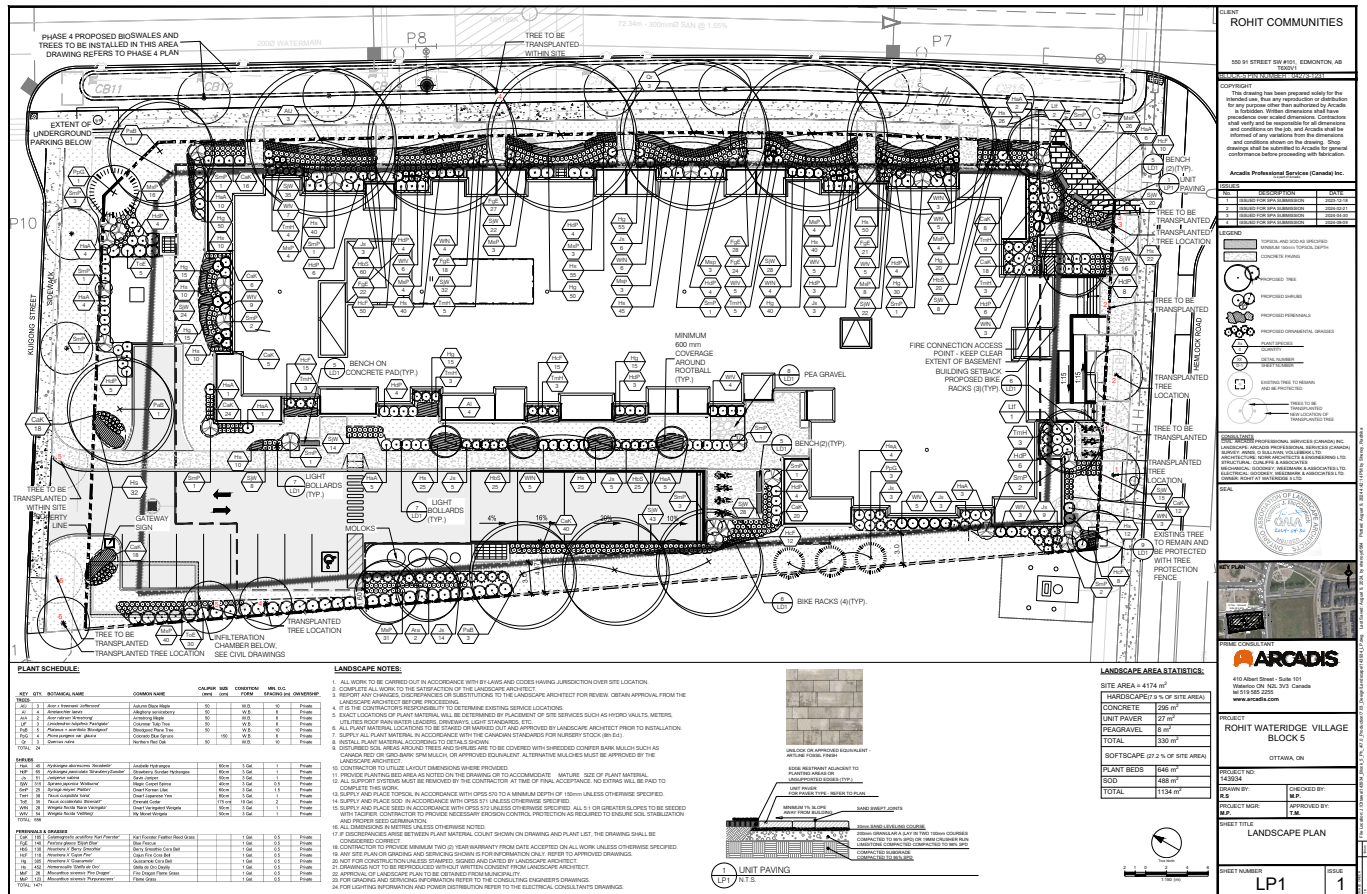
Landscape plan, courtesy of Arcadis (August 2024).
